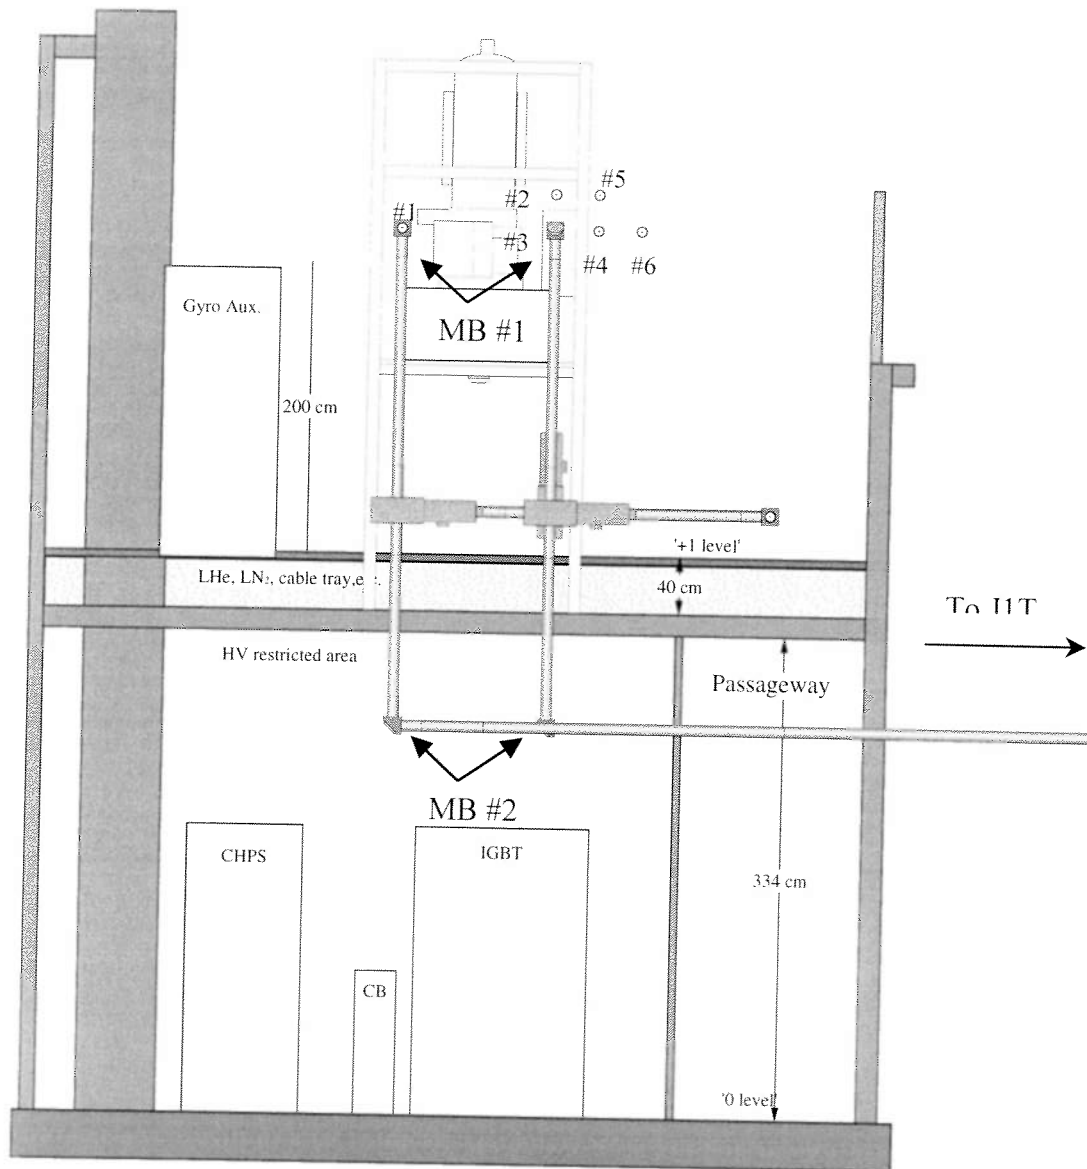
Layout of the gyrotrons and wave guide lines on the gyrotron platform as viewed from the East. The horizontal section of waveguide runs toward the J1T building and is positioned >2.5m above the ground floor.
